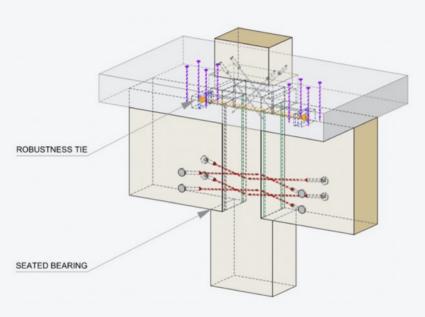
T3 Collingwood Beam-to-Column Seated Bearing Connection. (Photograph: Icon; Detail: ASH)
